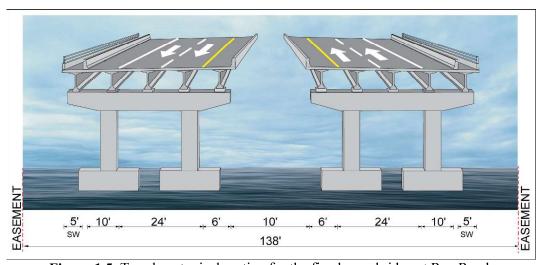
Two-lane typical section for the fixed span bridge at Rye Road.
